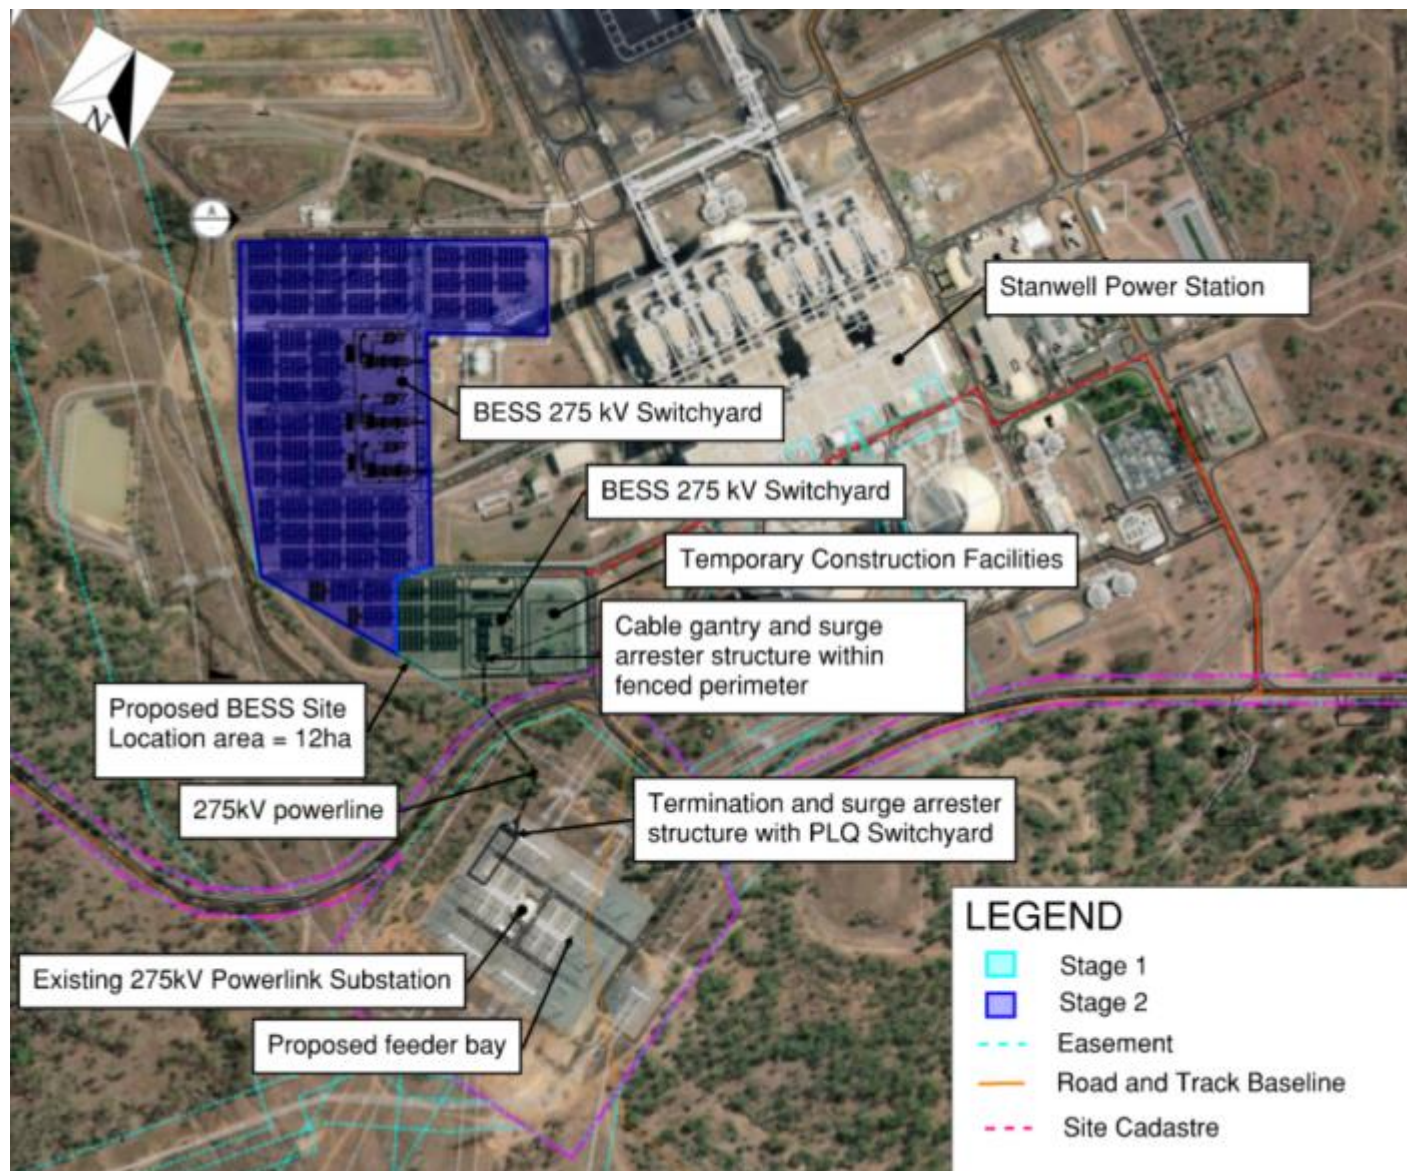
Stanwell BESS site layout (excerpt CREZ BESS Planning Report, 2022)
